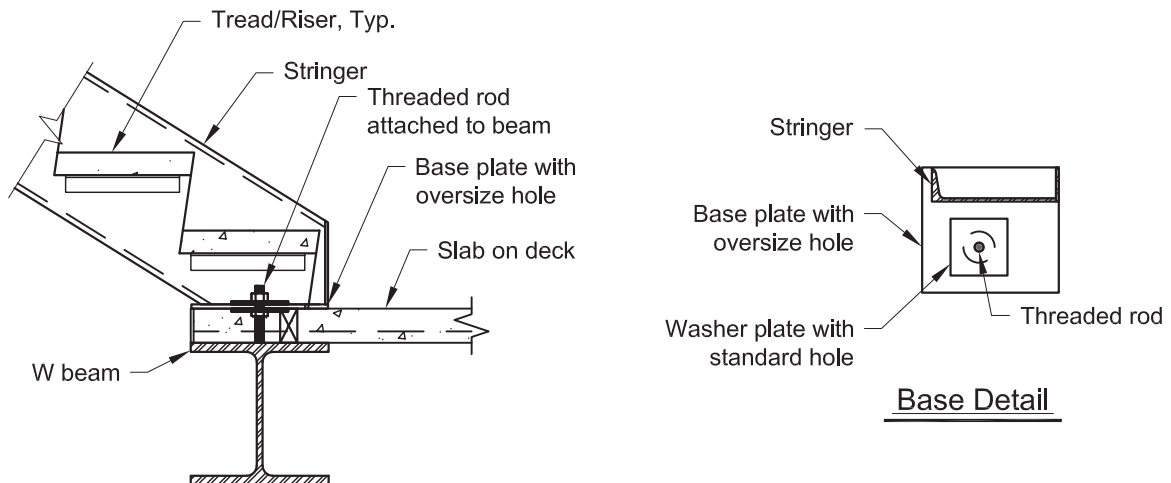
Seismic displacement detail using sliding connection at concrete slab on deck.
